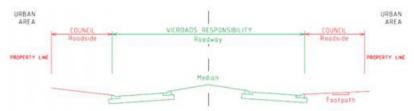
Demarcation Arrangements for Typical Rural Arterial Roads
